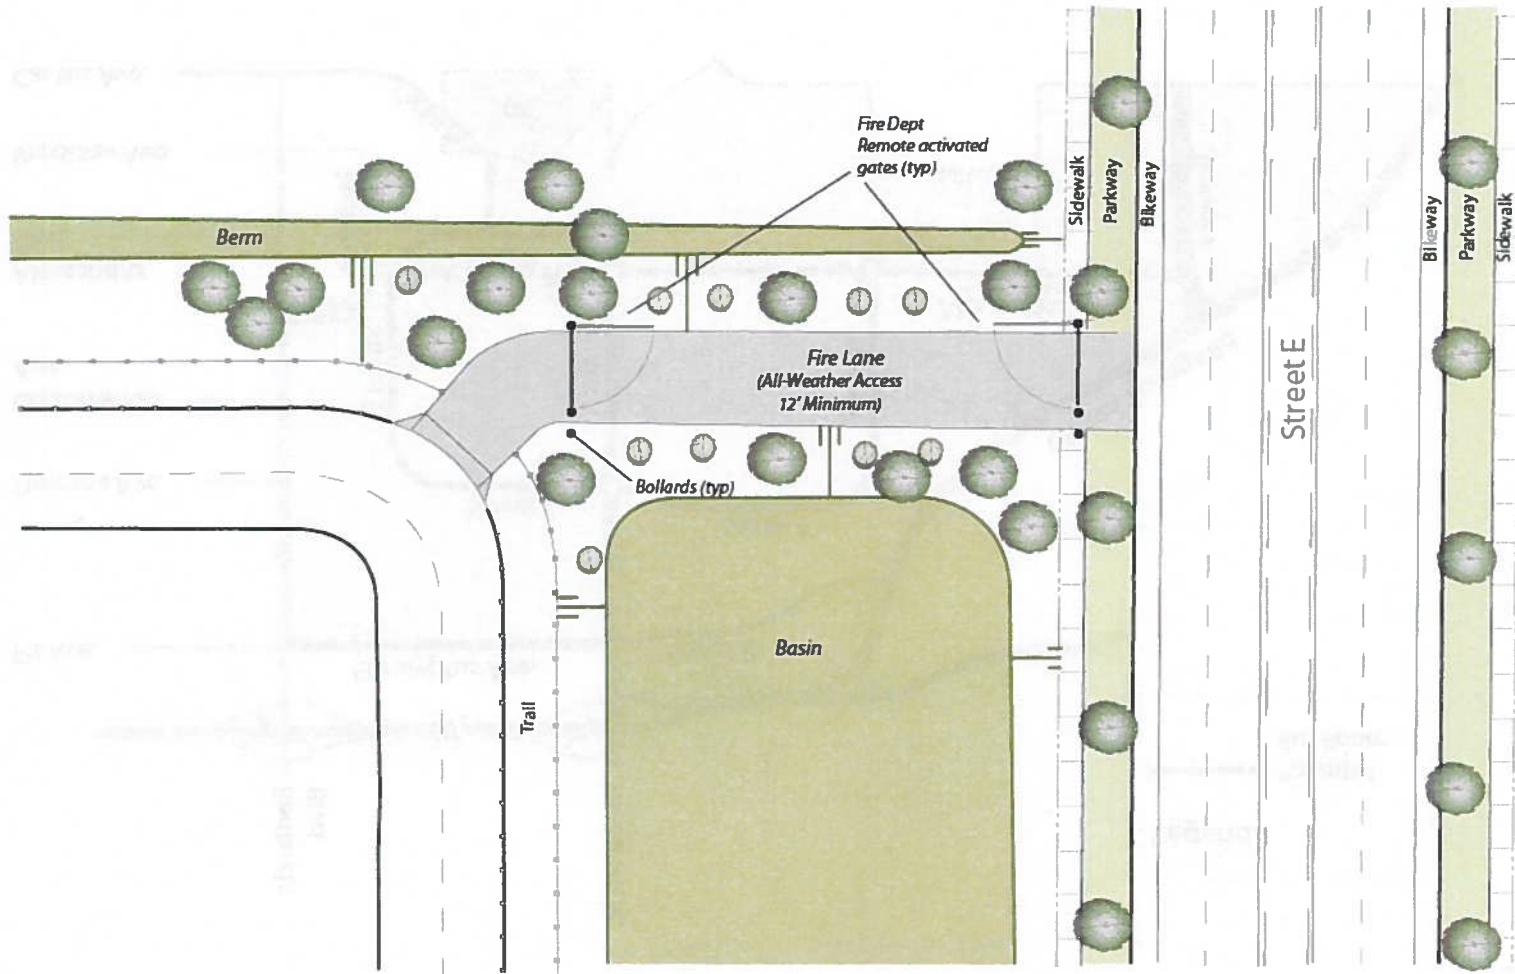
Multi-Use Trail Plan (pg.3-13)
